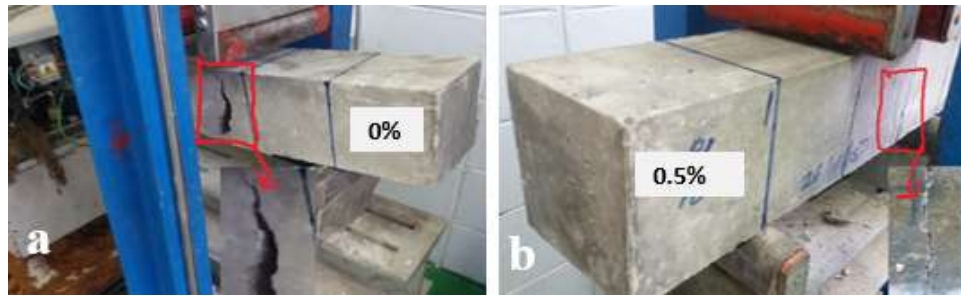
Failure Manners of (a) PC-0% Specimen and (b) KBFCC-0.5% Specimens
